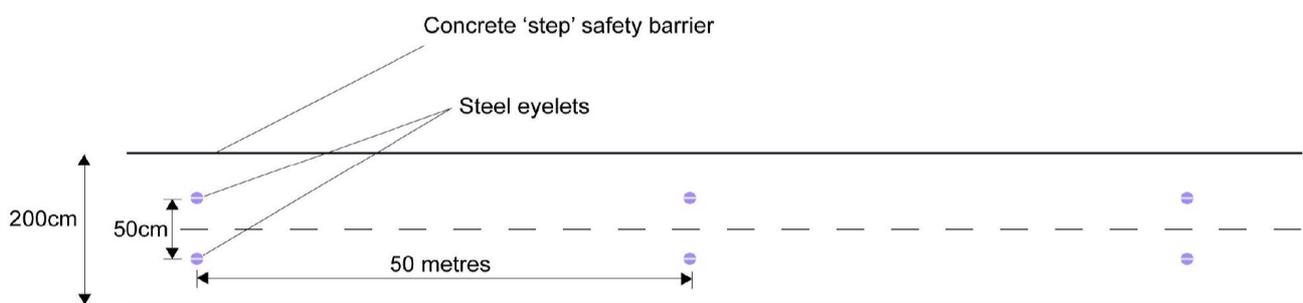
Steel eyelets installed on the top surface of concrete safety barrier (plan view)
